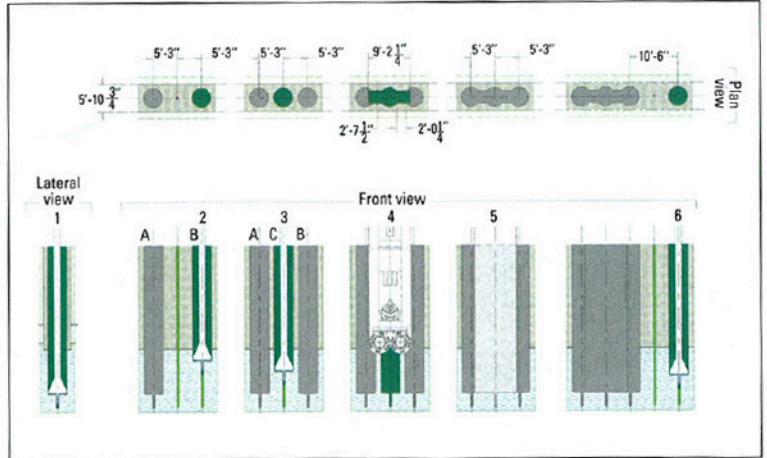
Typical installation sequence for the combined barrier wall method, showing: (1) reverse circulation drilling dia. 50' in (1270 mm) down to specified depth; (2) after concrete maturity of Shaft A, execute Shaft B; (3) after maturity of Shaft B, drill Shaft C and pout concrete into shaft if required; (4) excavate with Hydromill a middle-connecting element, 2.62 in (800 mm) wide, down to design depths; (5) pour concrete into open excavation using the tremie method; and, (6) continue production of the compound wall with the same sequence.
